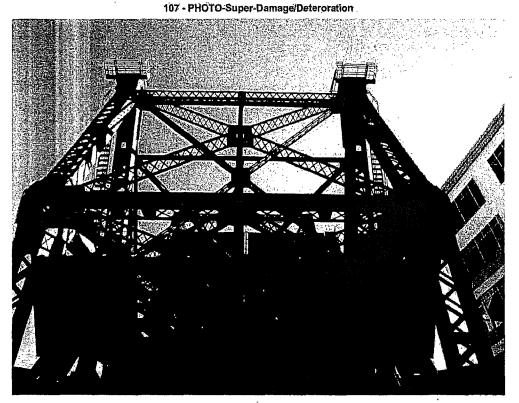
Top corroding surface of the counterweight trunion portion of the truss, typical
